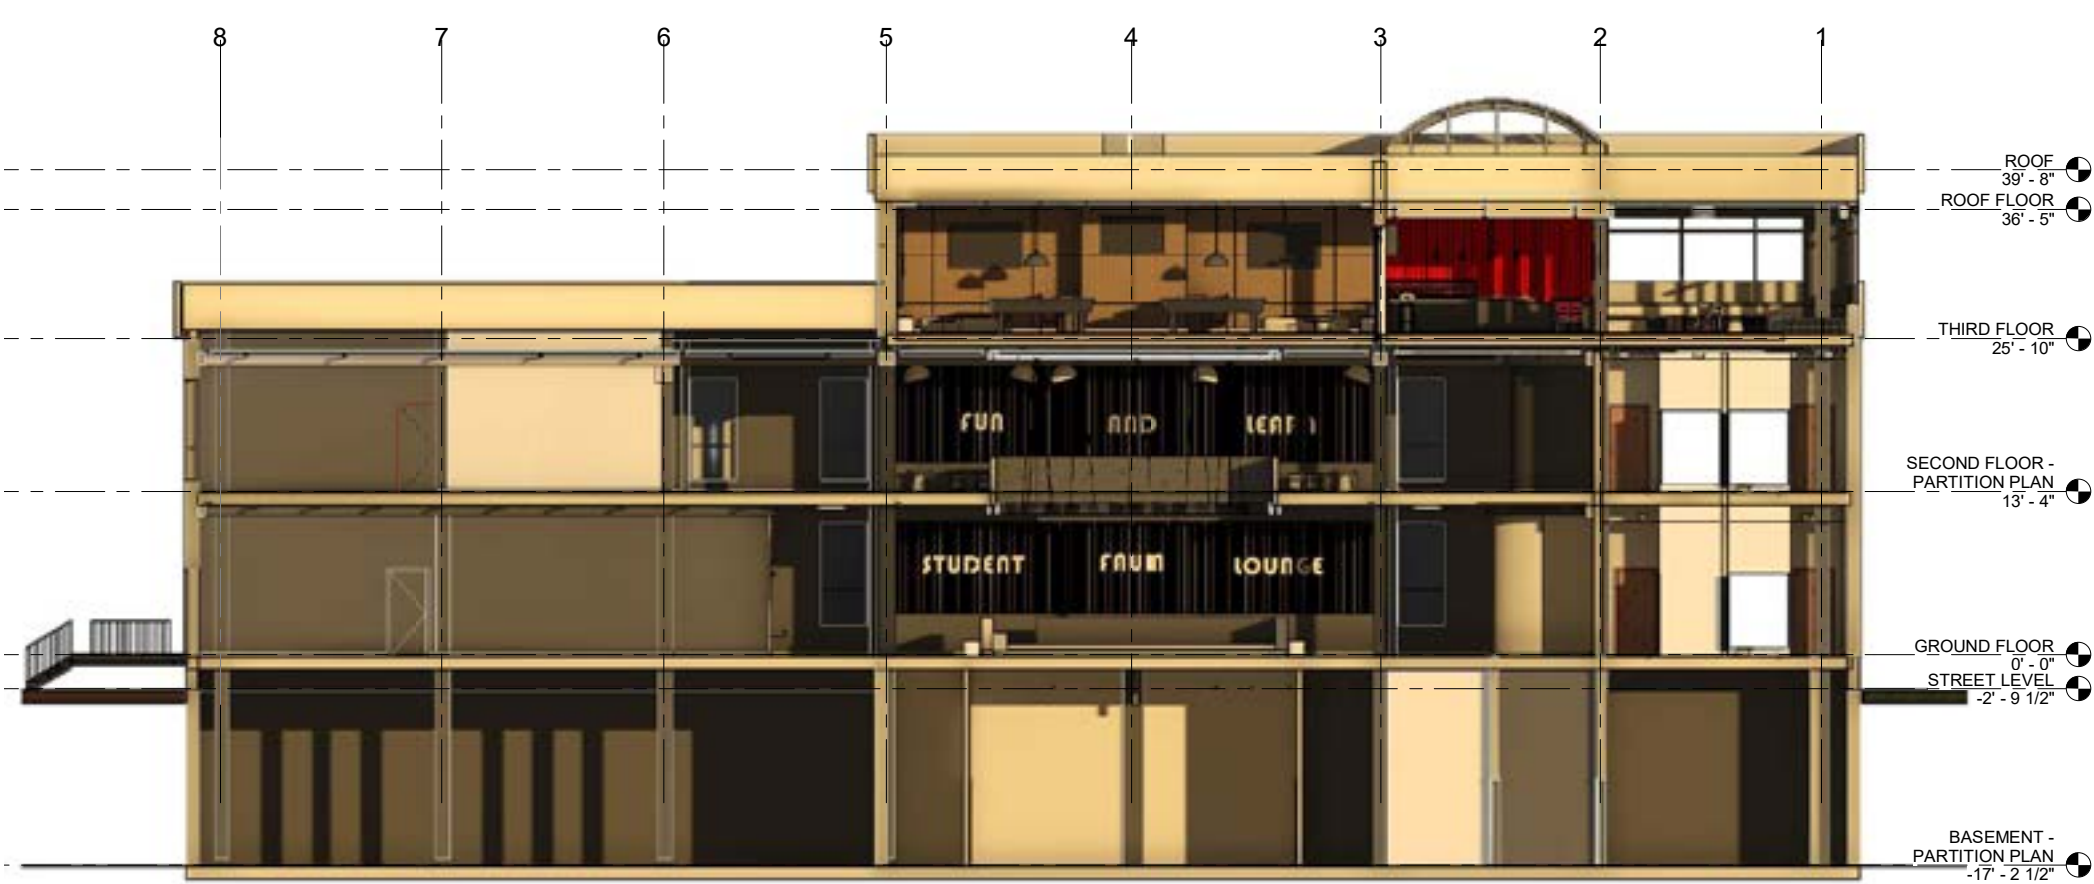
FAUM FUN BOX - BUILDING CROSS SECTION CUT N.T.S
